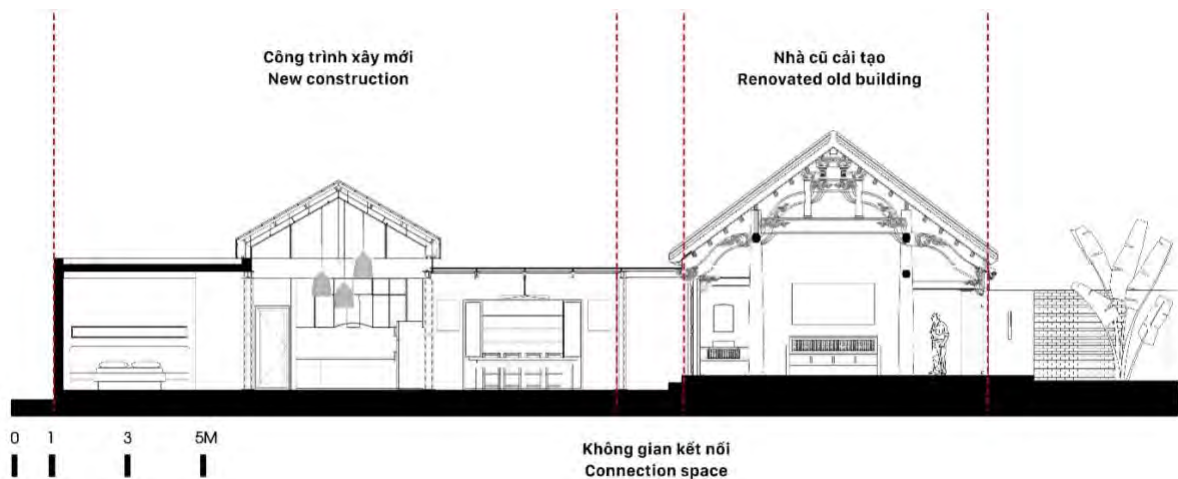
The cross section shows the connection in space, materials and architectural details between the two new constructions and the renovated ancient construction.
